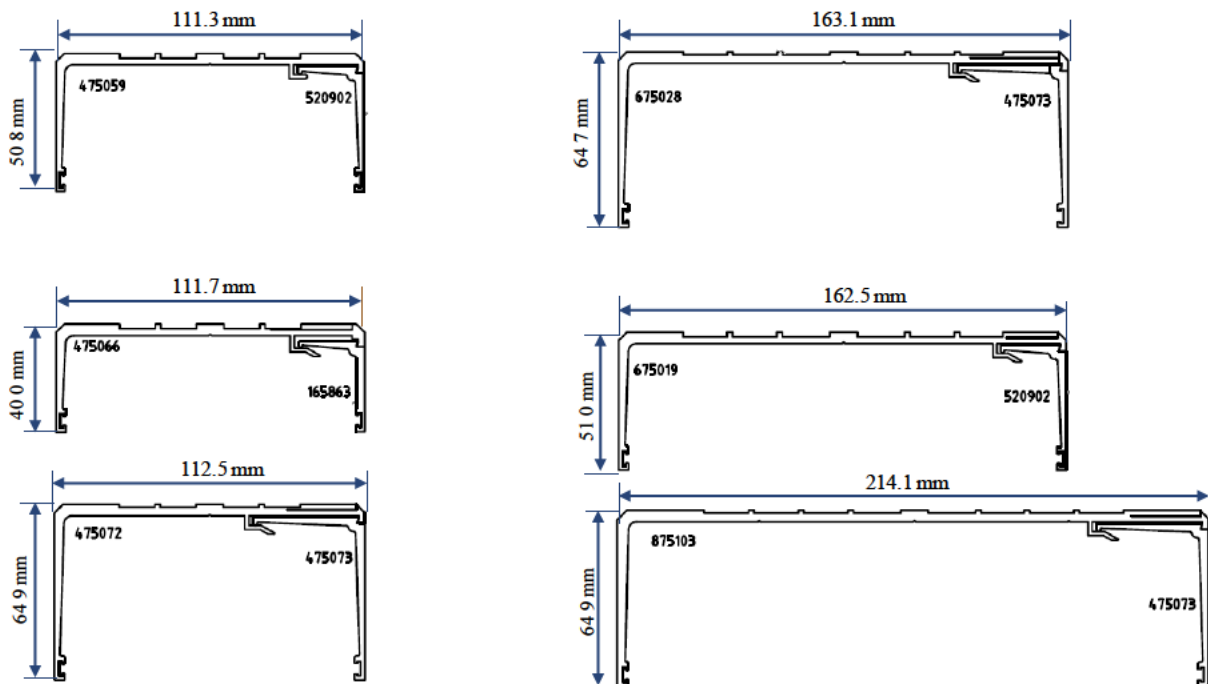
Sub-head with removable bead sections (<https://gjames.com/>).
